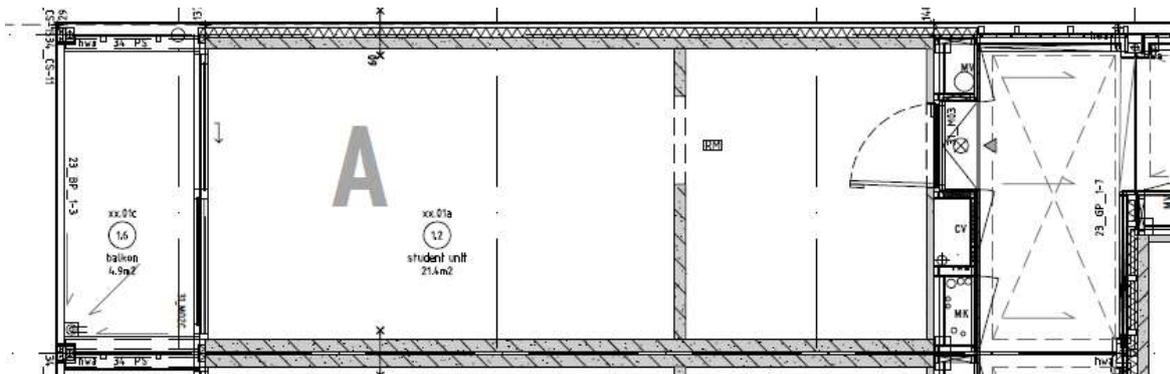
Structural floor plan (Pieters Bouwtechniek).
